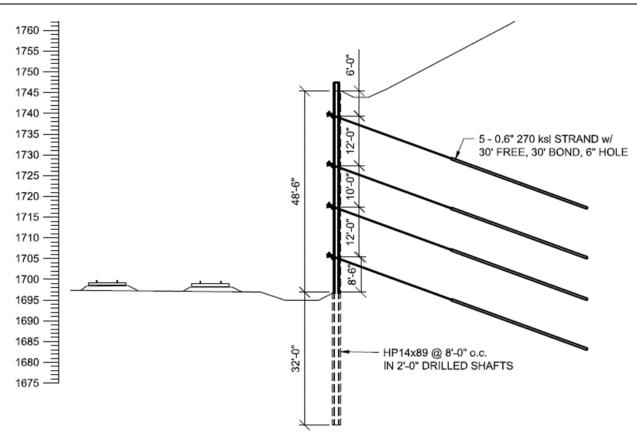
92.5 Foot Offset, Wall Location 1 Soldier Pile Wall
